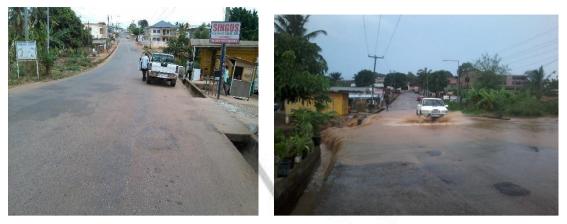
Kwadaso culvert site on a dry day. Plate 4.2: Kwadaso culvert site on a rainy day
